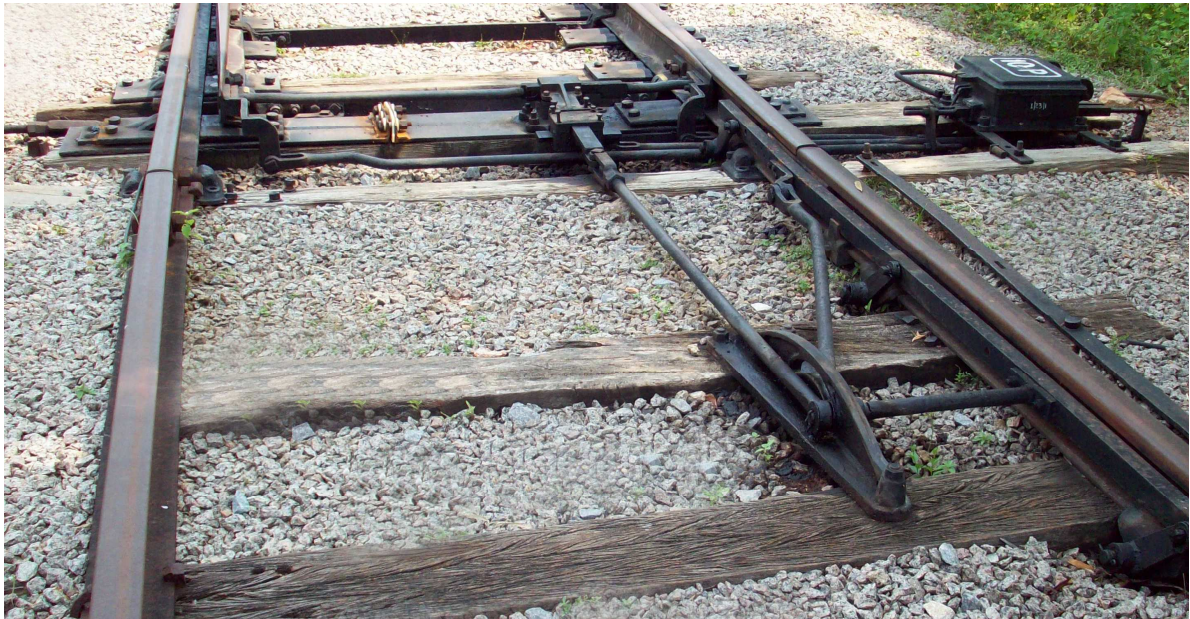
IRS LAYOUT WITH IN AND OUT TYPE OF LOCKING
